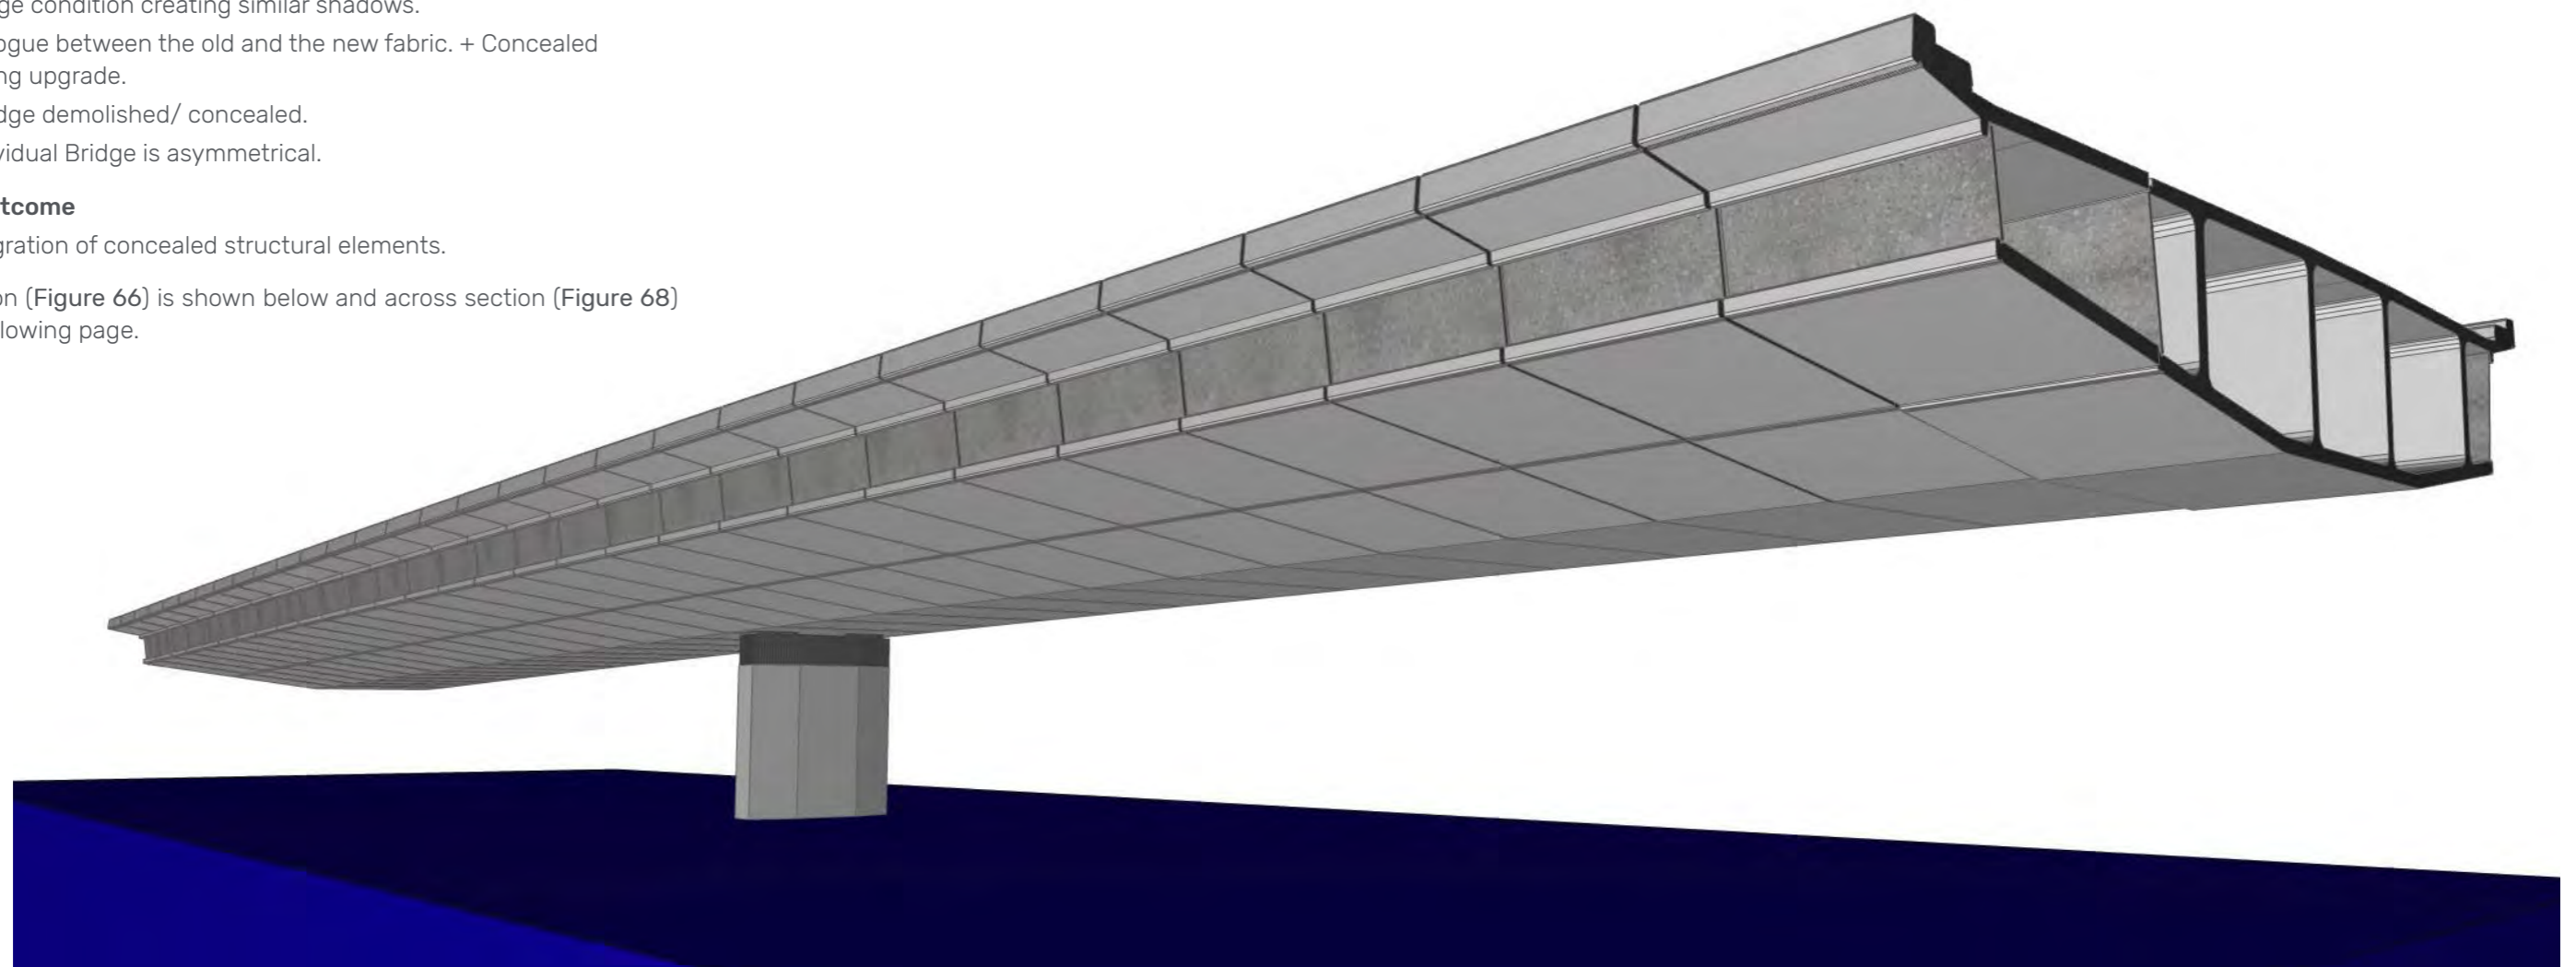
The design extends the existing shape of the soffit of the bridge to the required width and does replicate the existing edge detailing
